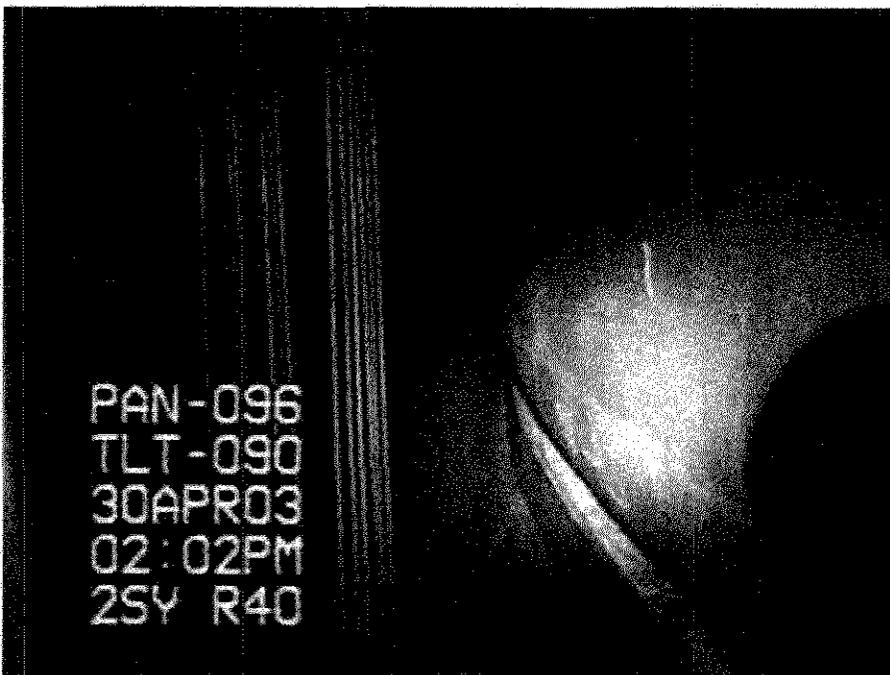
SY-102 Riser 40, Primary Tank, Annulus Floor/Instrumentation/Concrete Insulating Ring (Left, 2003)
